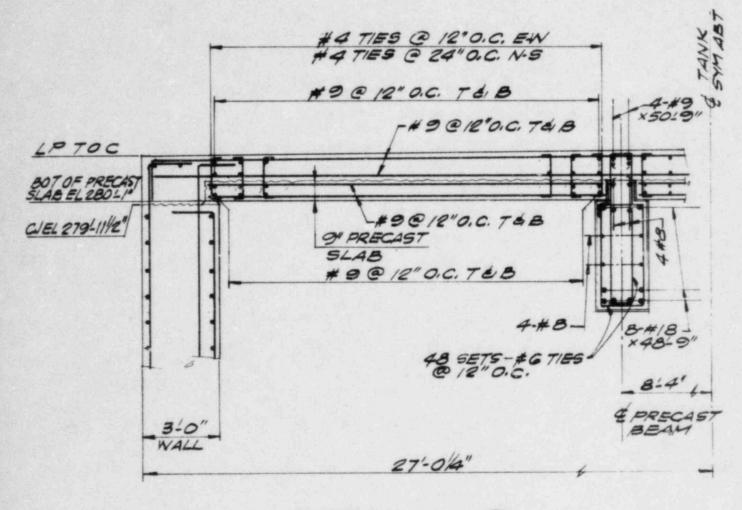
REFUELING WATER STORAGE TANK REINFORCING DETAILS (Sheet 1 of 3)
